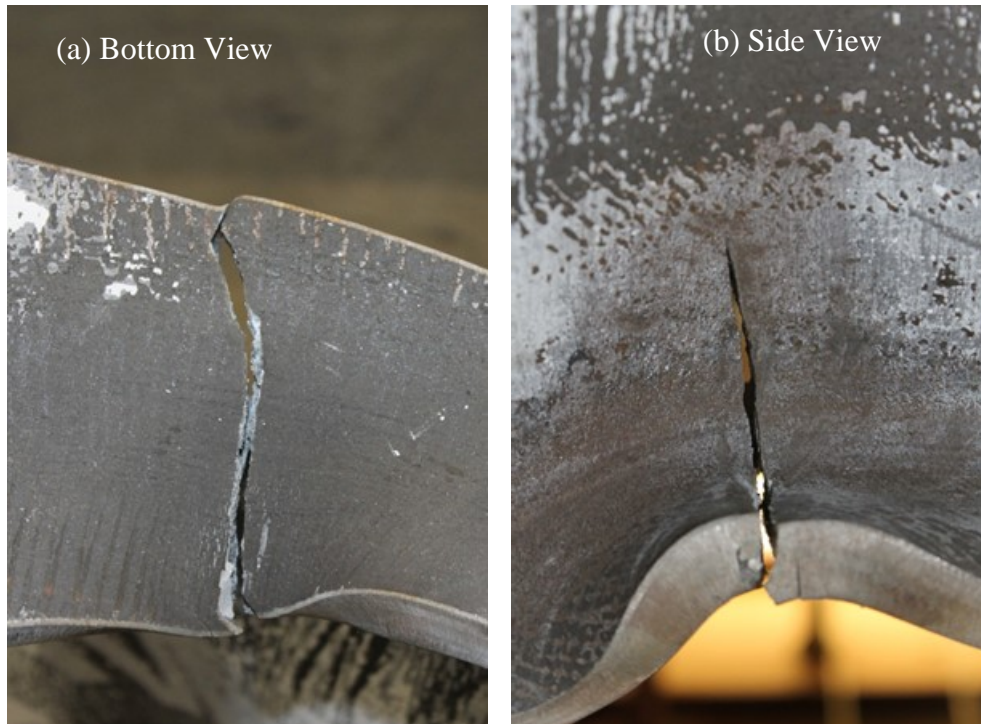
Fracture of the Bottom Flange and Web in Specimen 5 (W24x62 with RBS and Puddle Welds)
